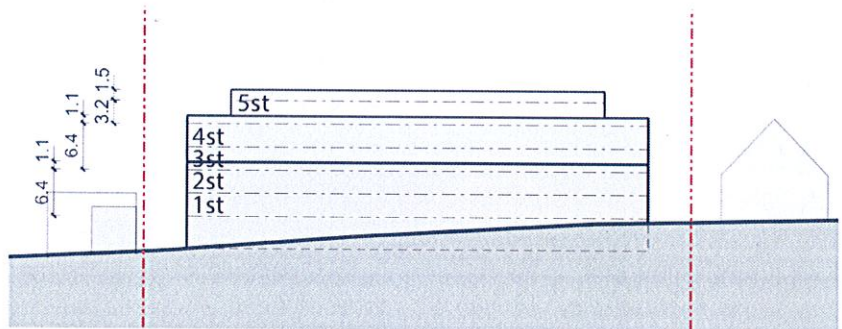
Marion Street _ Building envelope _ Section A-A
